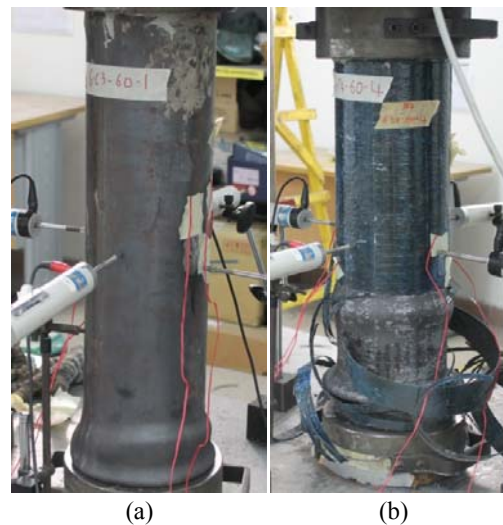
Failure of tested specimens; (a) unrepaired and (b) repaired specimen.
